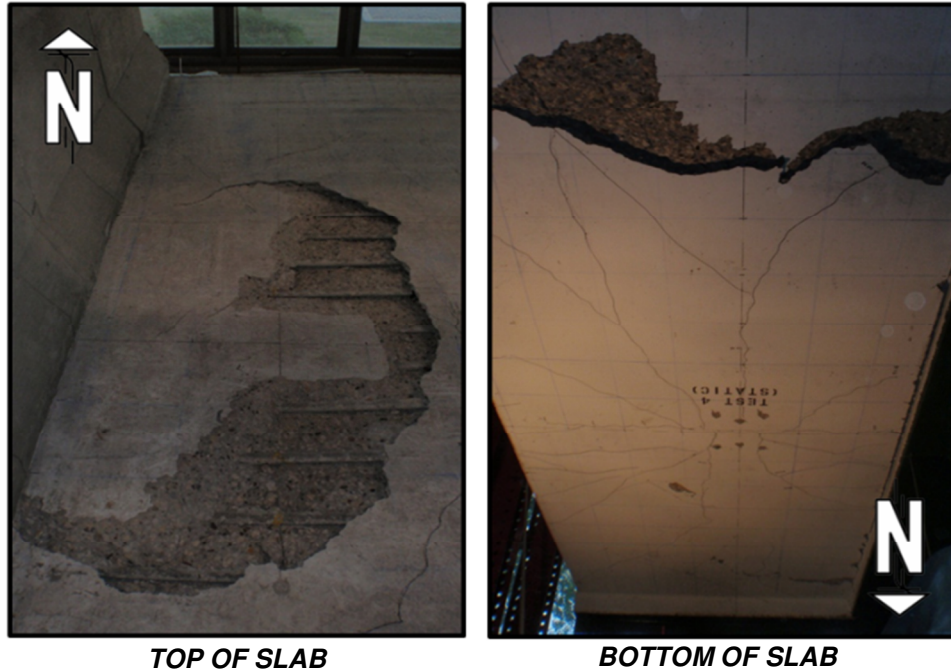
Top and bottom views of punching shear type failure for the cantilever section with GFRP reinforcement subjected to a static monotonic load
